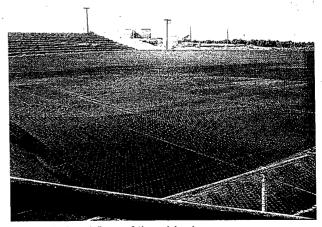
View of a separation sumps and wastewater sumps looking west.
